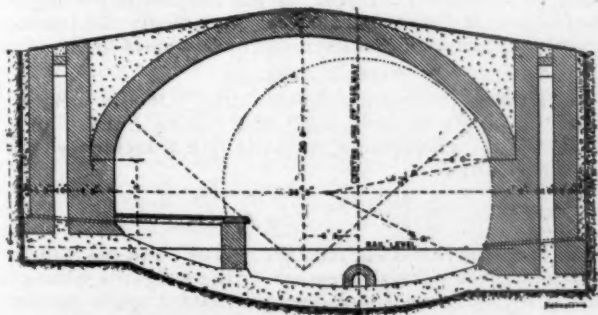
TRANSVERSE SECTION OF COVERED WAY No. 7, BRIDGTON SECTION.
